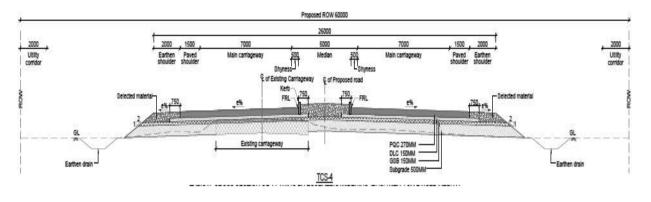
TCS-4 Typical Cross Section Of 4-Laning By Eccentric Widening (RHS) With 4.0m Raised Median
